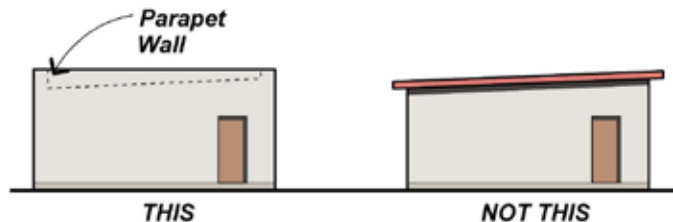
Parapet wall to screen roof mounted equipment .
